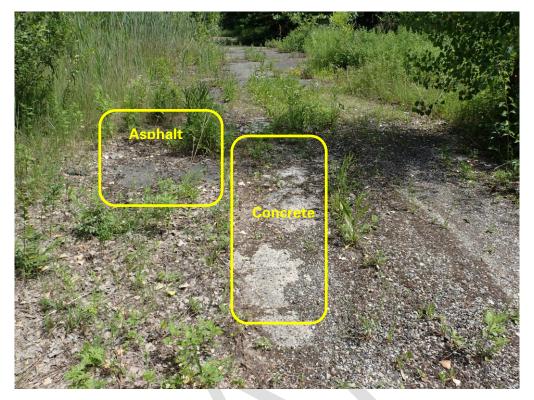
Concrete pavement adjacent to shoreline escarpment, looking south. Note asphalt patch on the left.
